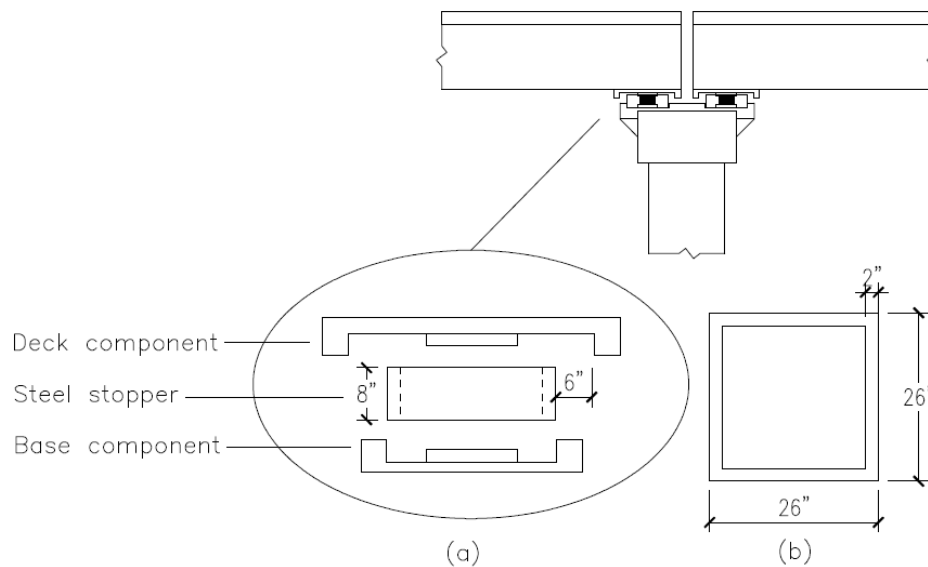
(a) Side view of deck component, stopper, and base component, (b) top view of stopper
